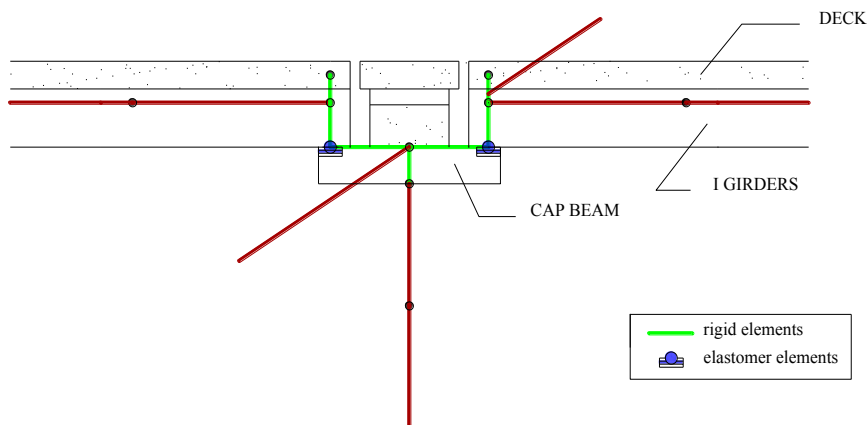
Superstructure-Cap Beam-Column Connection at Expansion Joints
